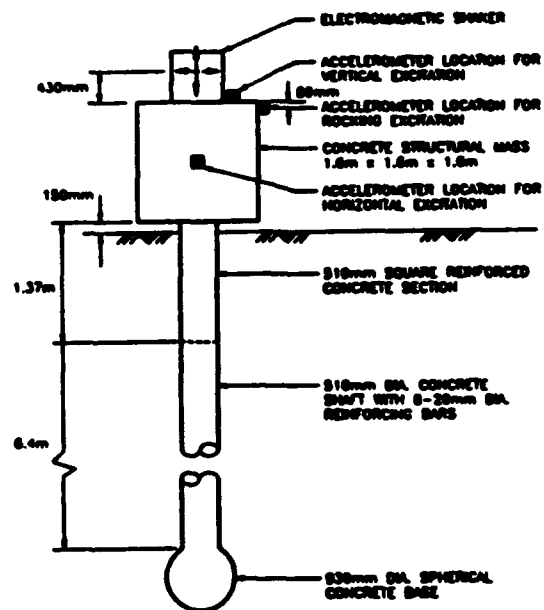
The layout of the full-scale vibration test on a single pile.
